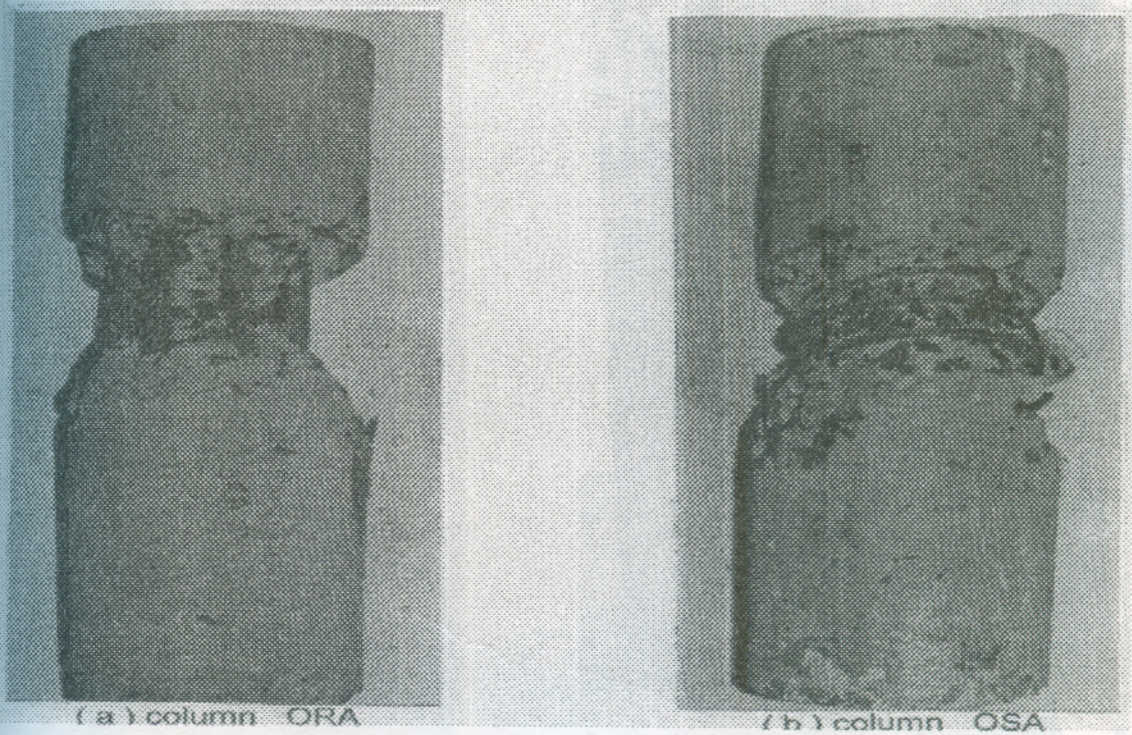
Failure of reinforced concrete columns, ORA and OSA.
